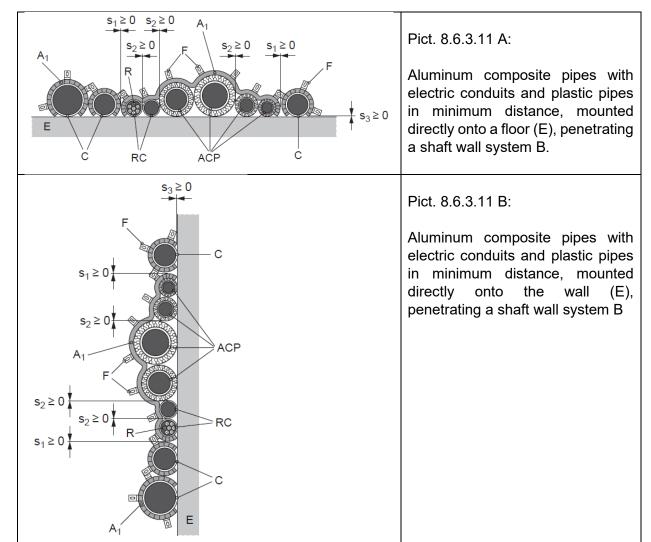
Aluminum composite (MLC) - pipes with electric conduits and plastic pipes in minimum distance, mounted directly onto the wall /floor (E), penetrating a shaft wall system B
